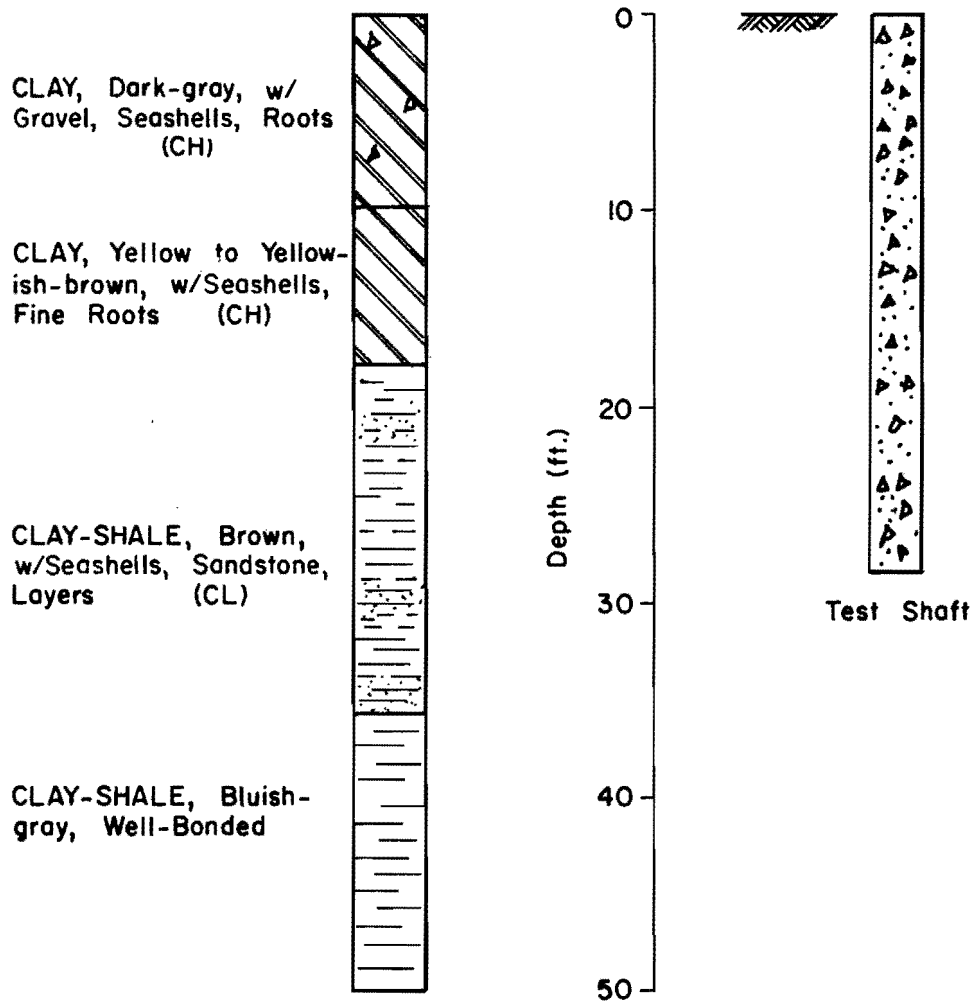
Soil and shaft profiles, San Antonio test site (Site II)
